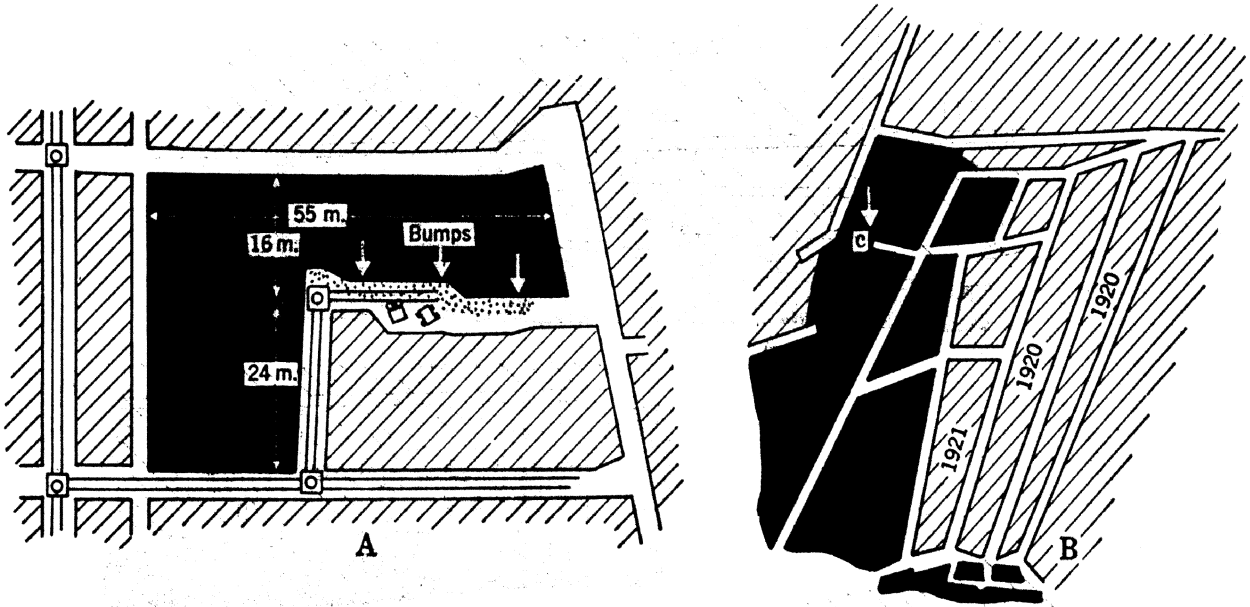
Mining Practices That Have Caused Bumps in Longwall Mining; the Bumps Occurred Where the Pillar Remnant Formed a Highly Stressed Abutment Area on Which Loads Were Imposed From All Sides. In B the Bump Occurred at C. The Roadway at C Was 35 Meters Long. (After Phillips (14).)
